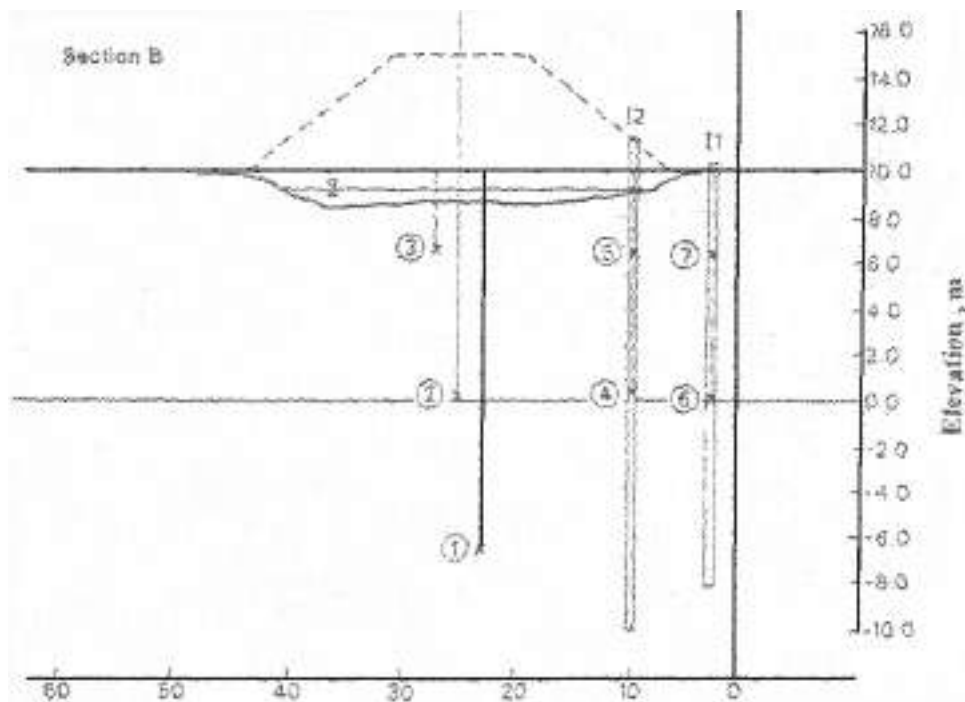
Cross-section of Al-Mdaina trial embankment.
